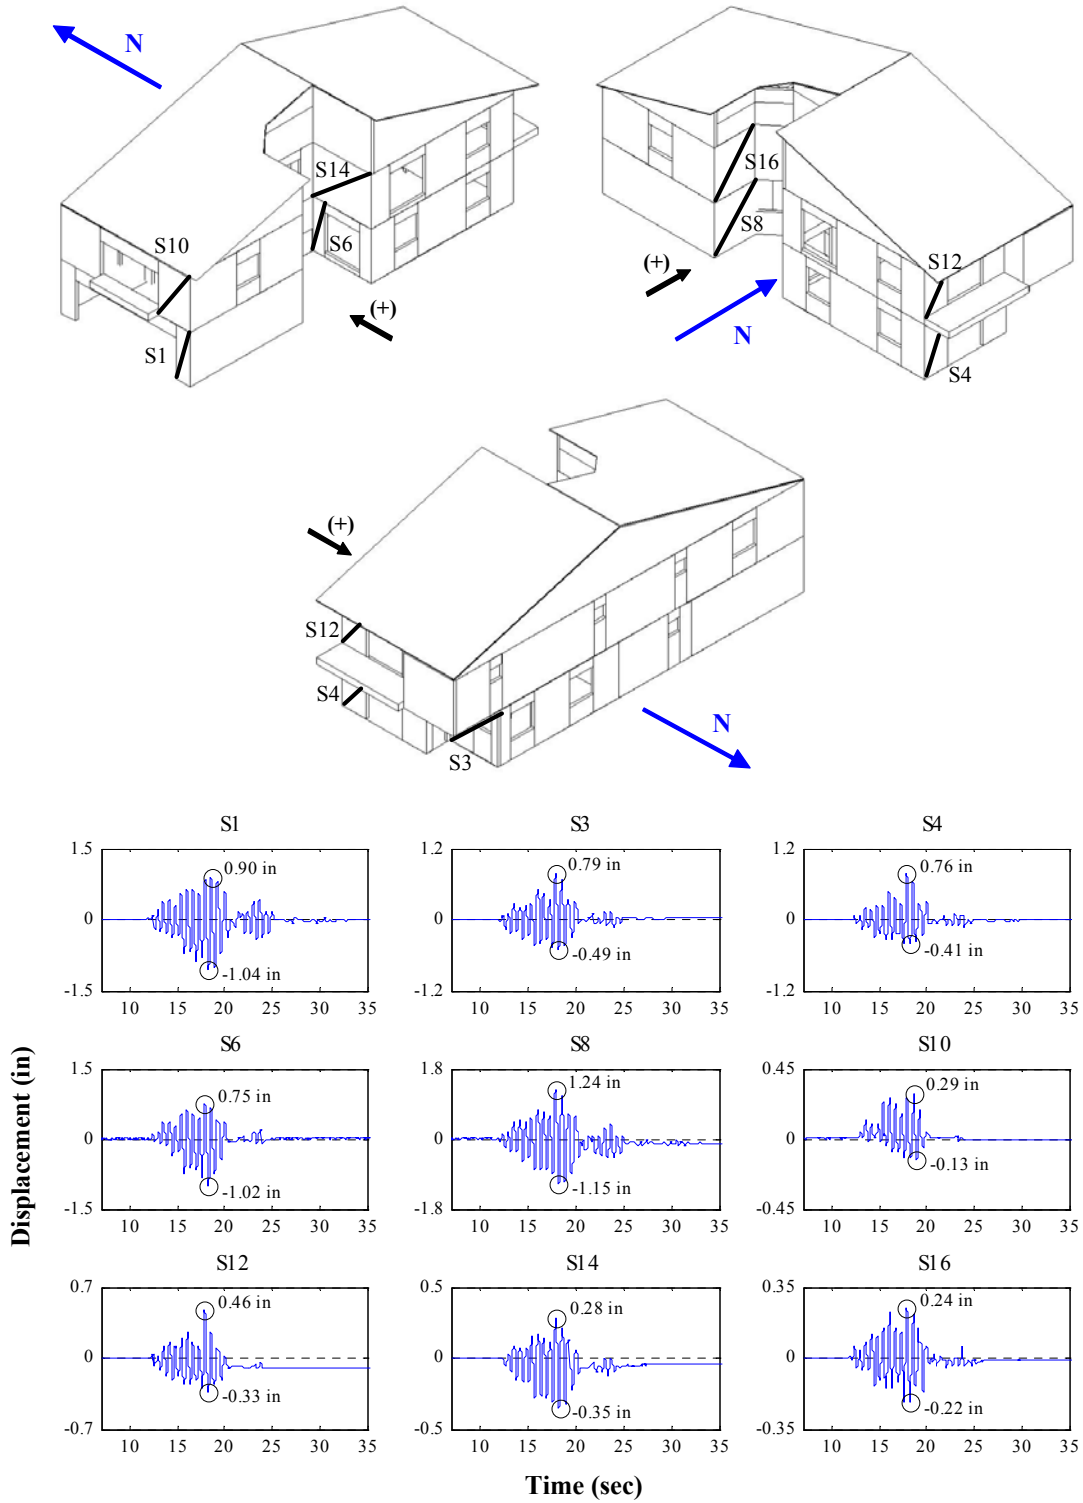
Wall deformations of north-south external walls for Test NWP1S017
